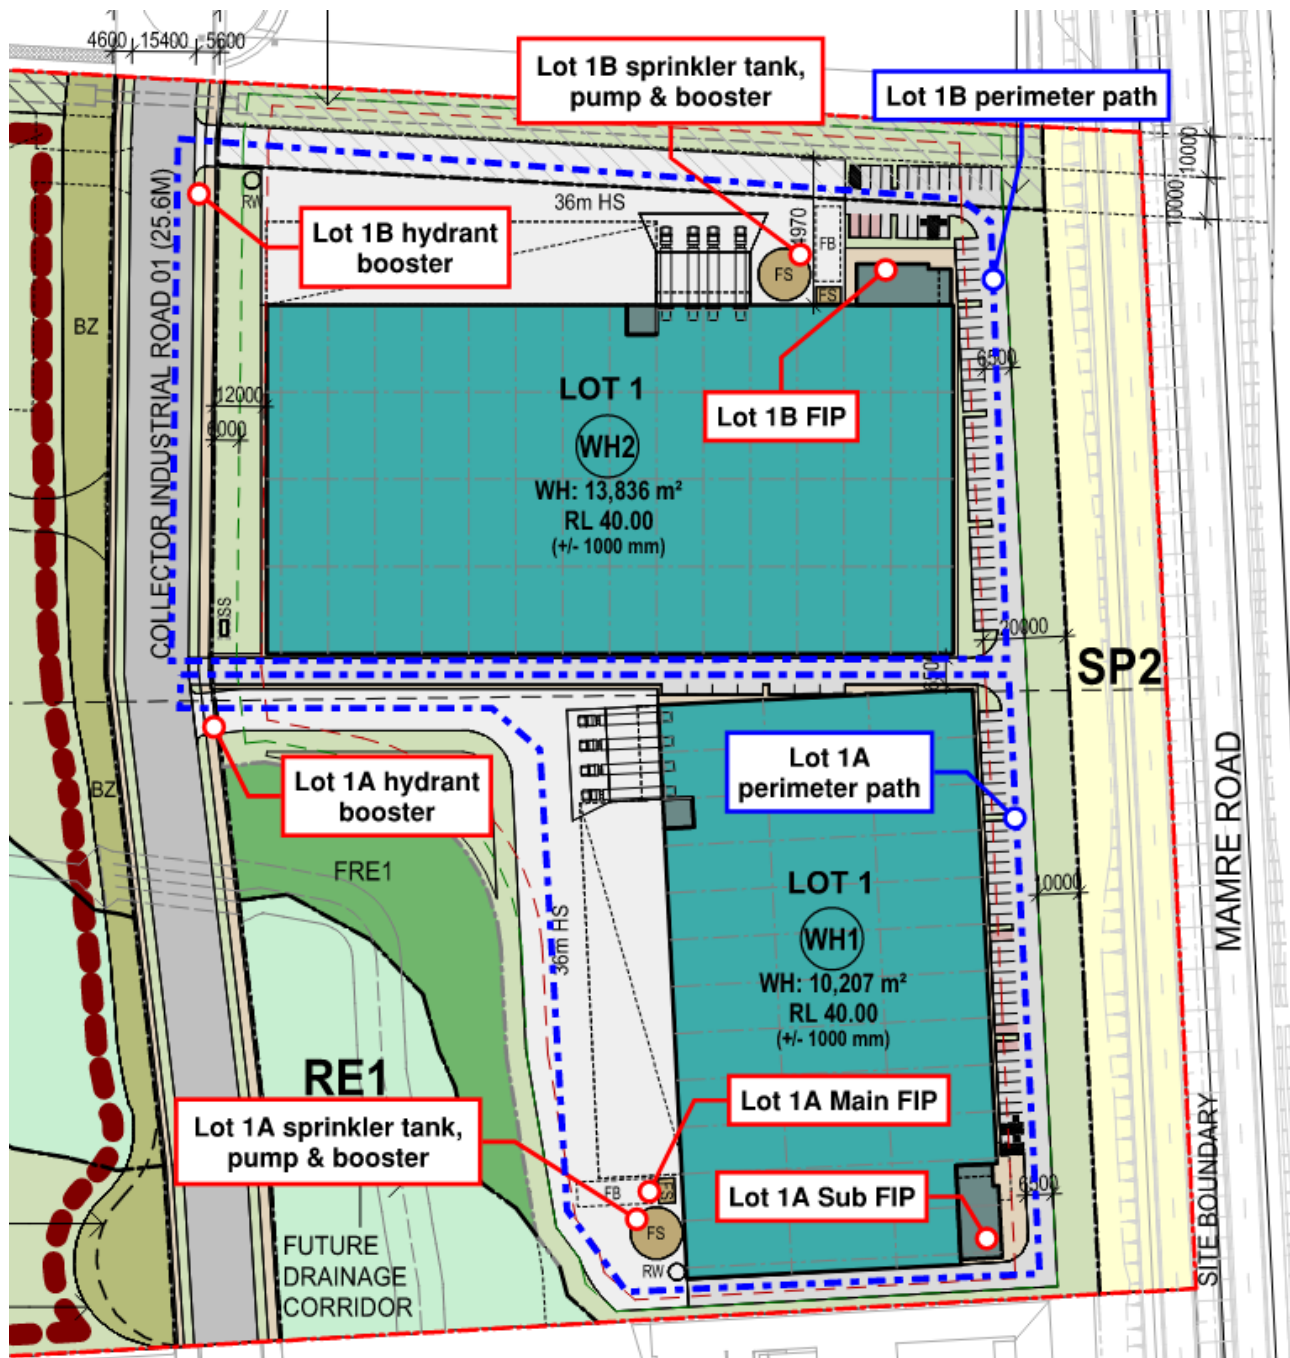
Proposed Site Plan Showing Fire Brigade Infrastructure
